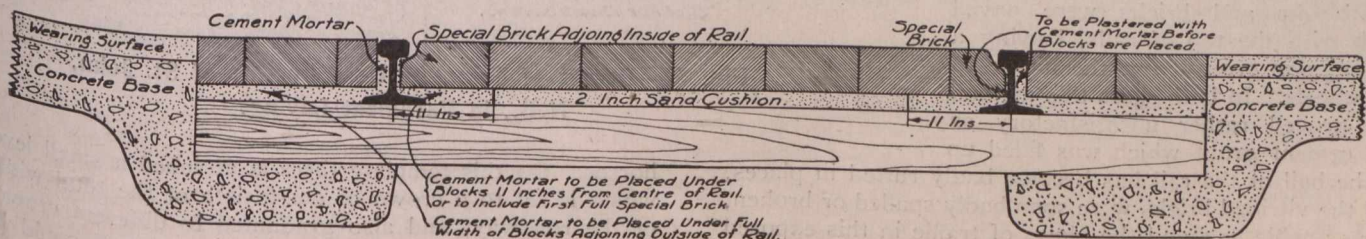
Detail of Rail Section for Vitrified Brick or Scoria Block Pavements.
